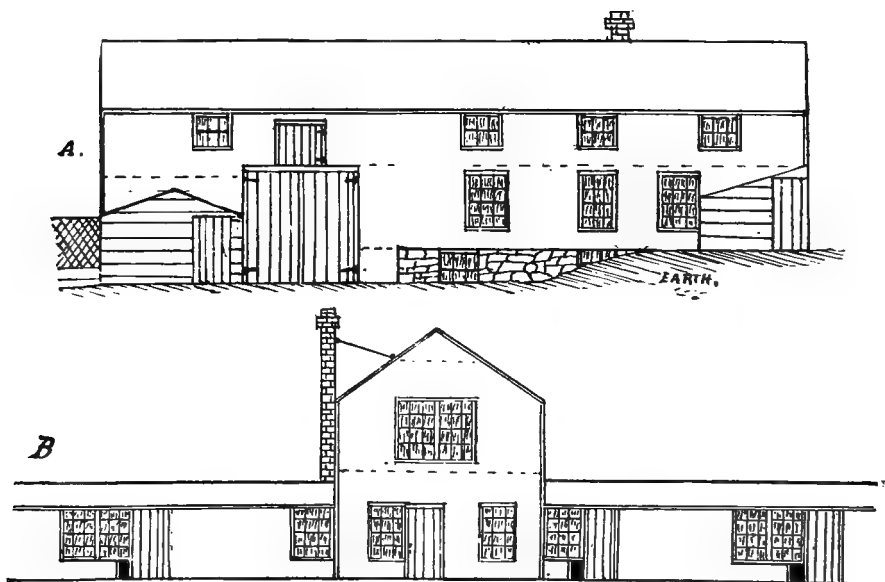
Elevations of Central Building in Fig. 23.—A, east side; B, south side.
